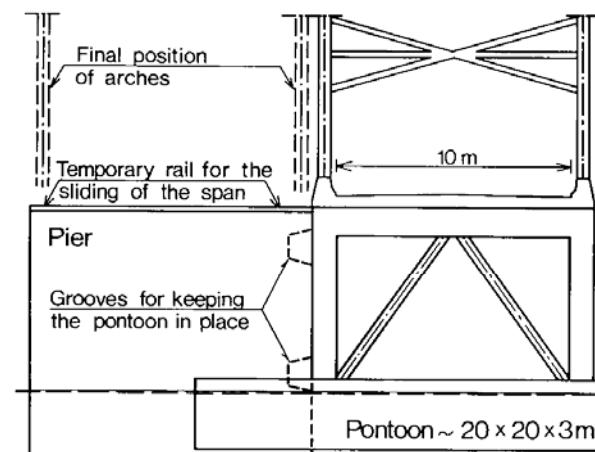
Pontoon and pier with the span on the pontoon ready for transfer.
